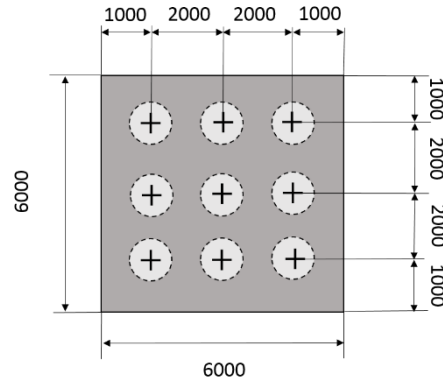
Plan of the 3×3 hinged pile groups configuration.
